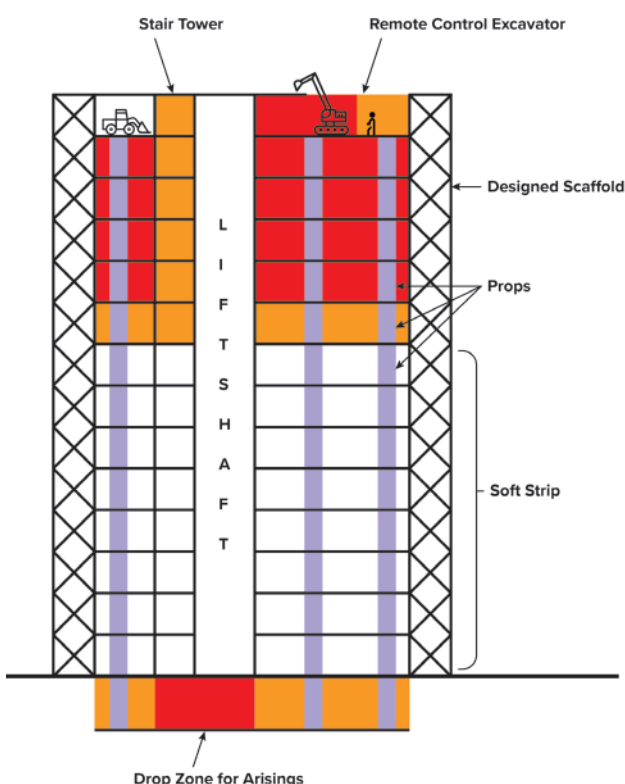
shows a tower block with a lift shaft and stair tower. The building has been back propped and scaffolded, and a four-floor exclusion zone specified for safety reasons during the machine demolition. Soft strip can continue in the lower parts and an AMBER zone has been set up to restrict access to the demolition floors. The remote-control machine sits in the RED drop zone working into the leading edge whilst the driver is in an AMBER zone. It would be normal for the arisings to be bulldozed by a skid steer into the lift shaft and this would work in the AMBER ZONE on the working floor. The bottom of the lift shaft would be a RED zone with a well-managed system to allow removal. The design of the leading edge and the exact position of the RED zone will be a matter of planning and sequence. The demolition is likely to be on a bay by bay basis. This means in the demolition area the RED zone will normally be fairly small and it will move. Most of the floor area will be available for removing arisings and standing power packs for the machine on. Multi-storey demolitions are normally mainly repetitive cycles on the same structural method with some exceptions such as internal plant rooms.
